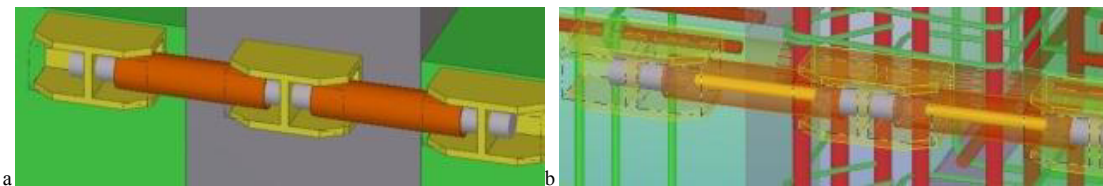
Schematic of dissipater tool, 9(a) outside, 9(b) inner
